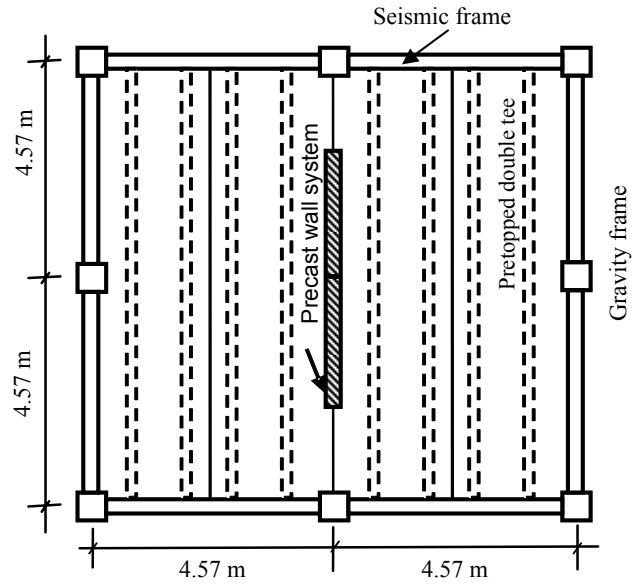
Plan view of the scaled post-tensioned precast wall system building
